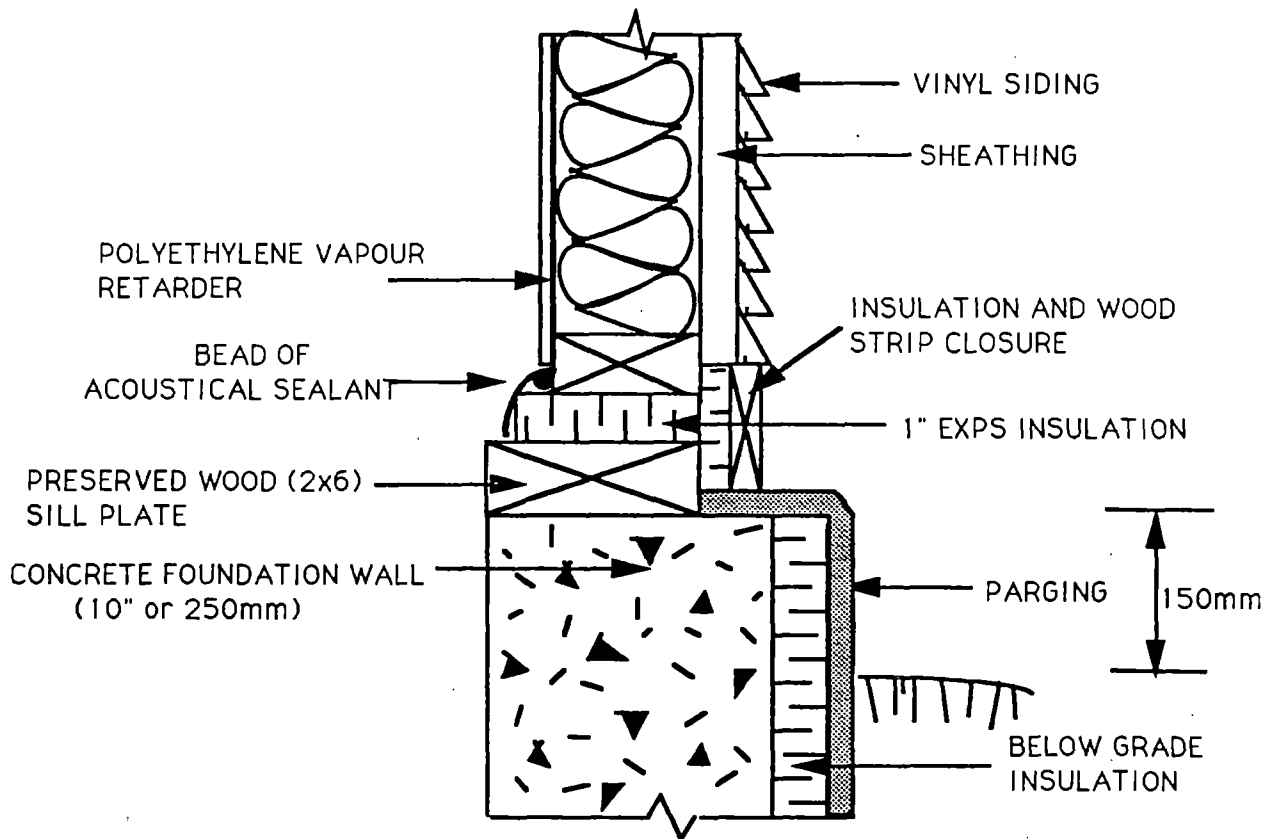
b - BOTTOM PLATE CONSTRUCTION DETAIL
